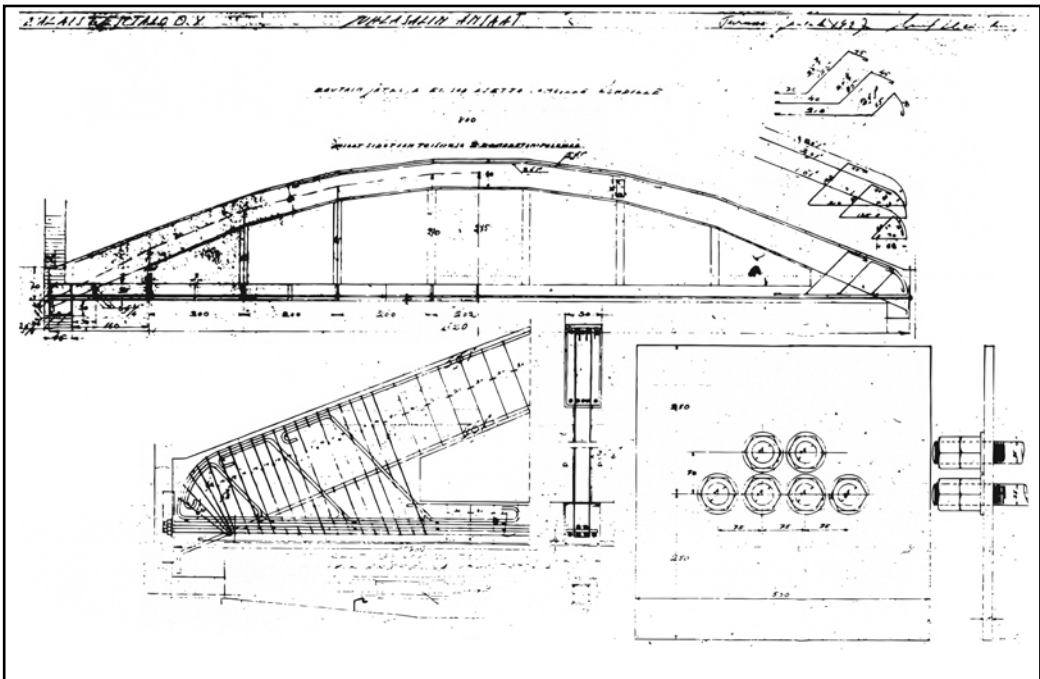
The Roof truss structures of the auditorium of the Southwest Finland Agricultural Cooperative Building made the flat ceiling possible. Emil Henriksson's structural drawing. The drawing has been edited. TKA.
